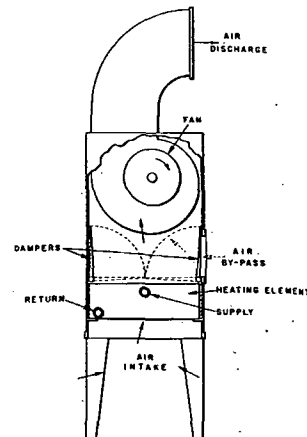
FLOOR MOUNTED UNIT HEATER, HOUSED TYPE FAN
